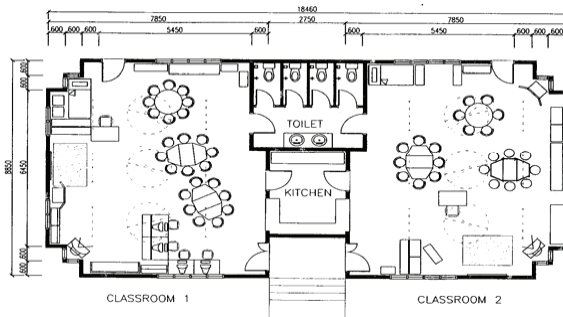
Example of layout floor-plan of new preschool building (annex building) with two classrooms
